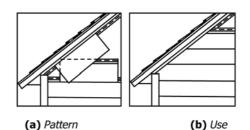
Using a Pattern to Match Panel End Cuts to Gable Angle
